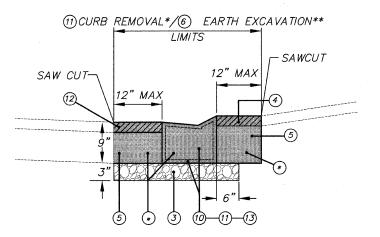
DETAIL SECTION SHOWN IS THROUGH DRIVEWAY FOR SIDEWALK THROUGH TURF REPLACE 465 WITH 9
